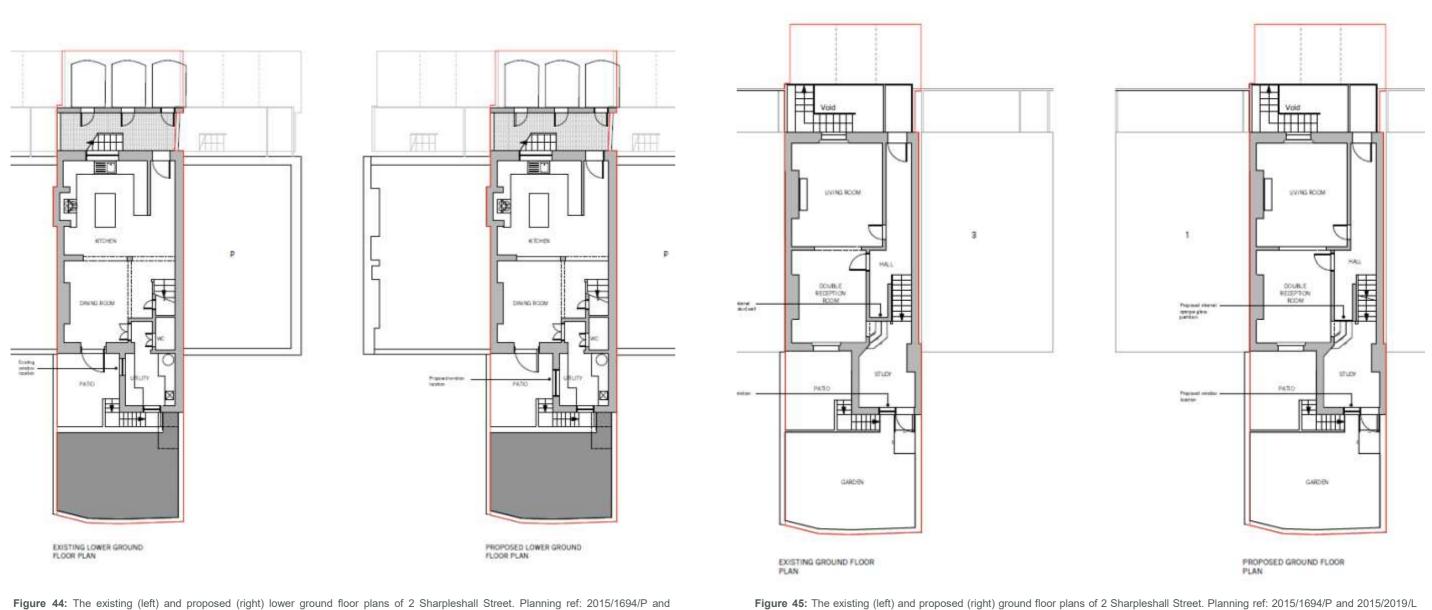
The existing (left) and proposed (right) lower ground floor plans of 2 Sharpleshall Street. Planning ref: 2015/1694/P and 2015/2019/L which was granted permission. The proposal included the moving and enlargement of the window in the flank elevation of the closet wing into the garden.
